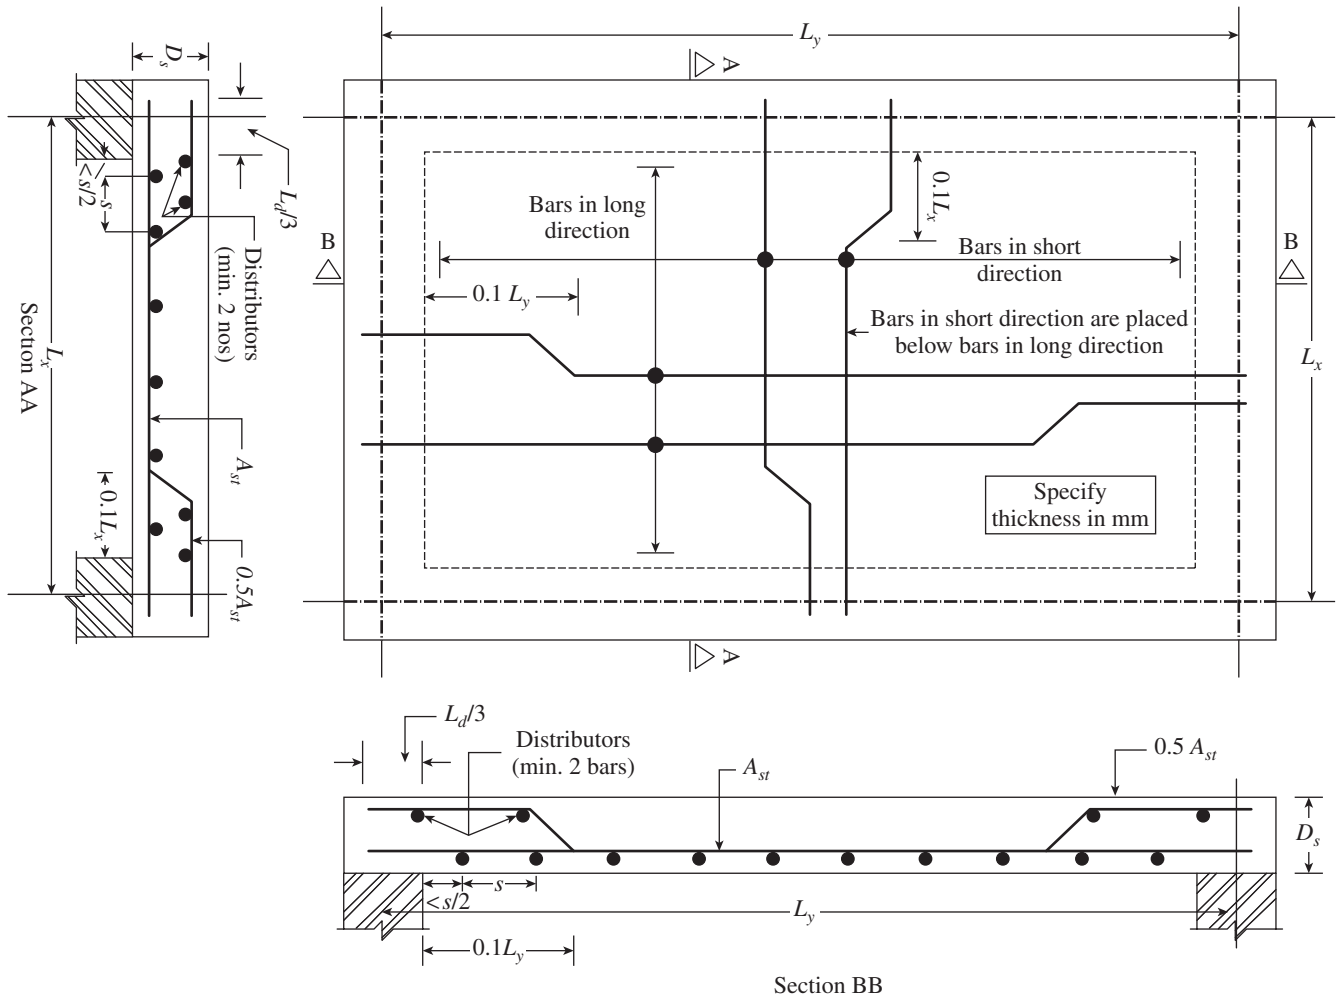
Detailing of wall-supported two-way slabs with bent-up bars
